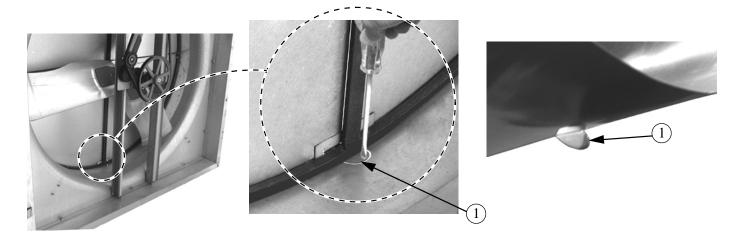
Drain Tab Bent down so water drains out of the Fan and away from building
